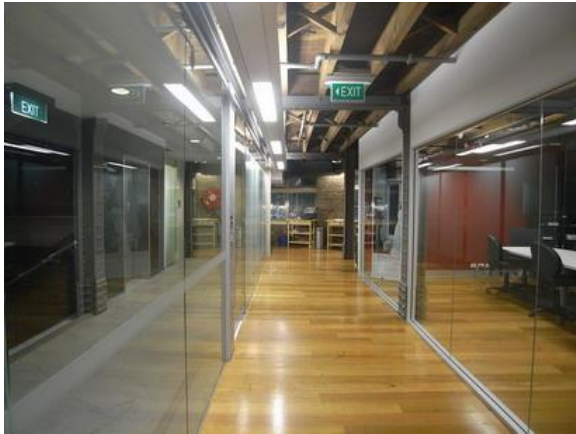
Ground floor, glazed enclosure to caged steel frame lift and stair
